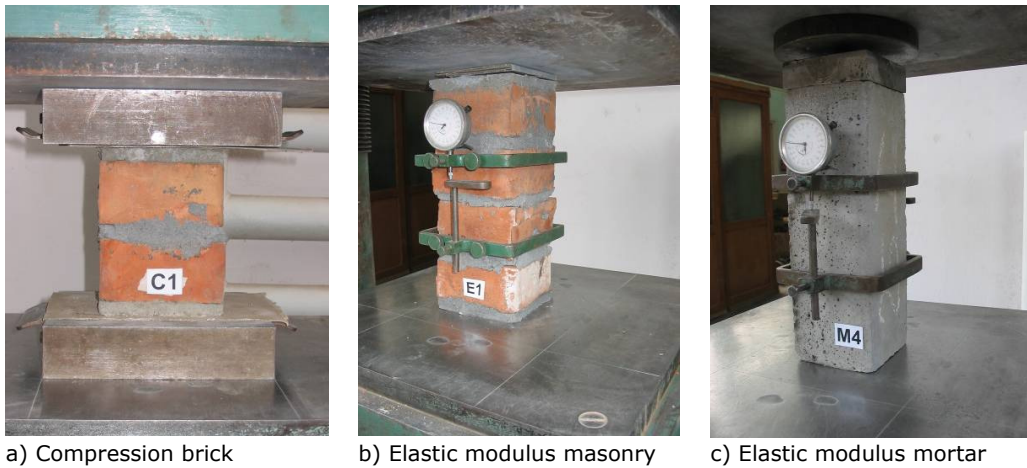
Tests on masonry and components (mortar and brick)
